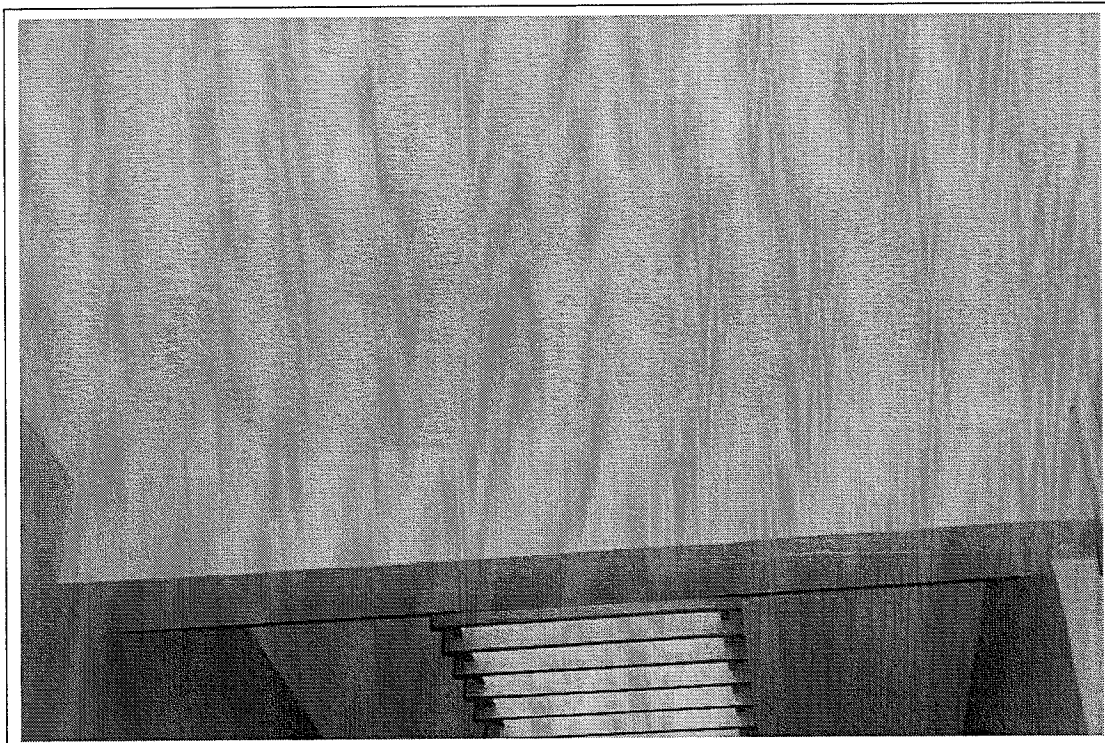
2nd floor, hallway outside offices - View of water damaged acoustical plaster
